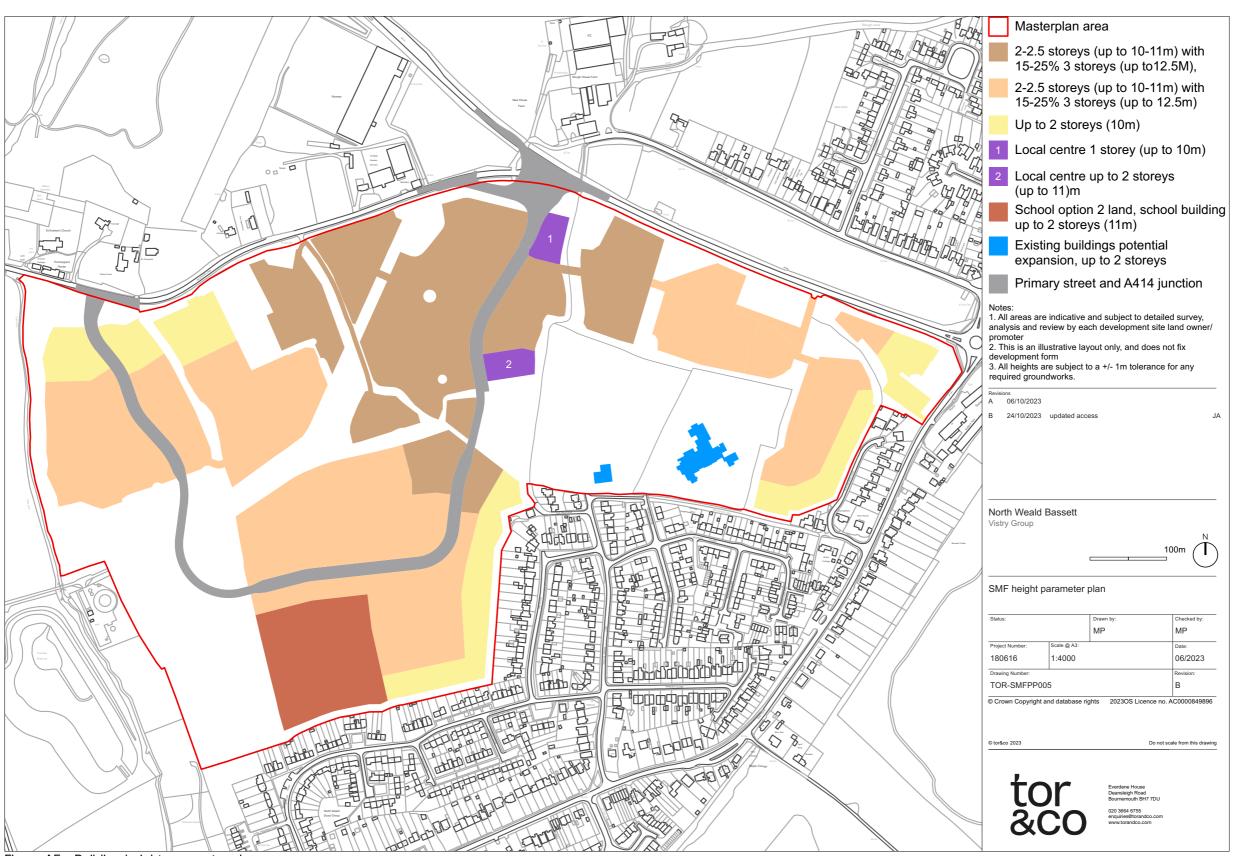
Building height parameter plan (note this an illustrative layout and does not fix development form)
